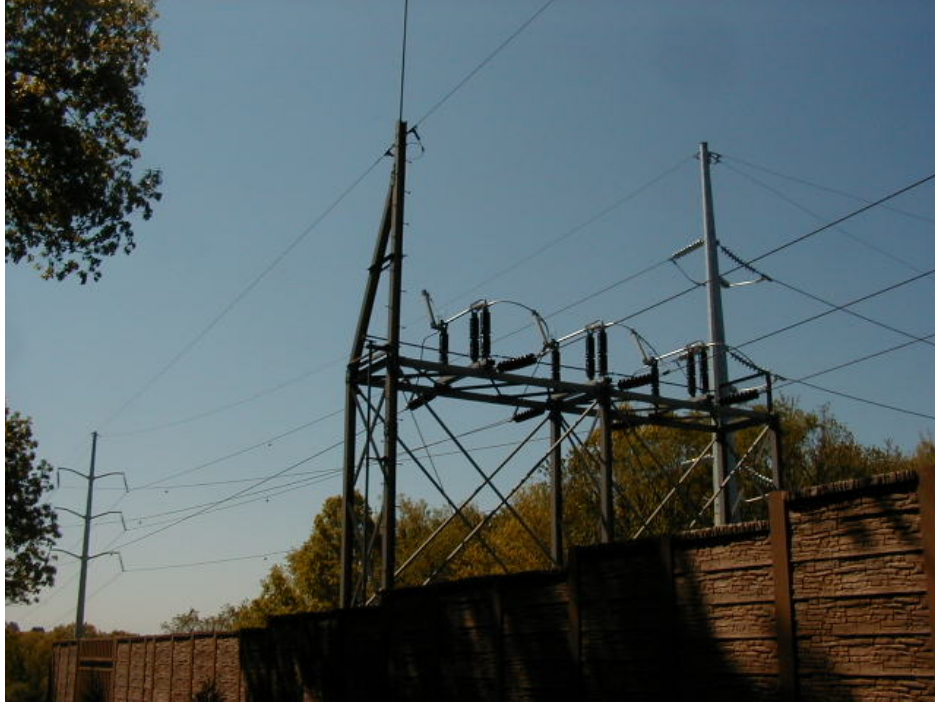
East wall of substation with structures NB31 (left), NB31A (right) inside substation and NB 30 in the distance (south of Trumbull substation).
